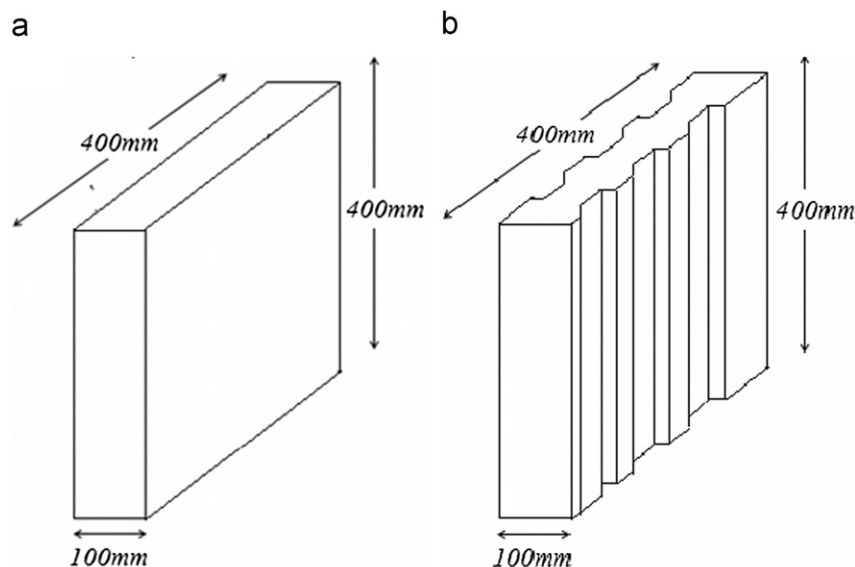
Dimensions of the two additional LFC core samples: (a) rectangular LFC panel and (b) profiled LFC panel.
